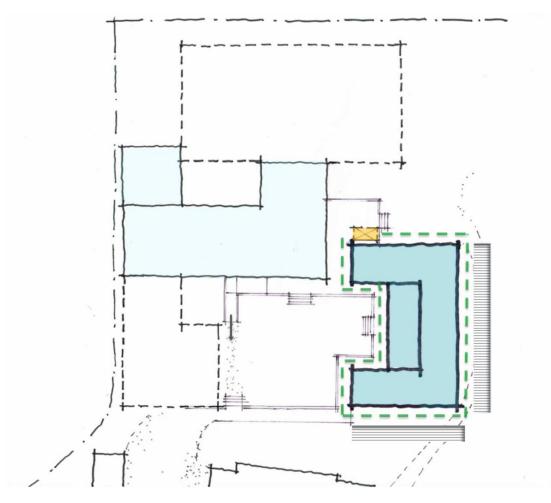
Building Type 1 – Rural School Building Site Plan
